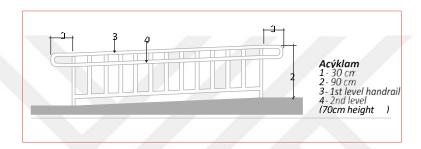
Handrail Grip Surface Application (TS 9111, 2011)
